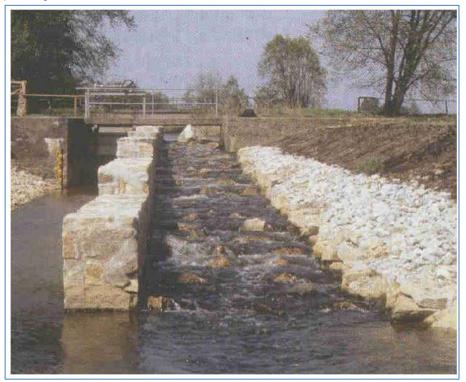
Typical Rock-Ramp Fish Ladder Structure
